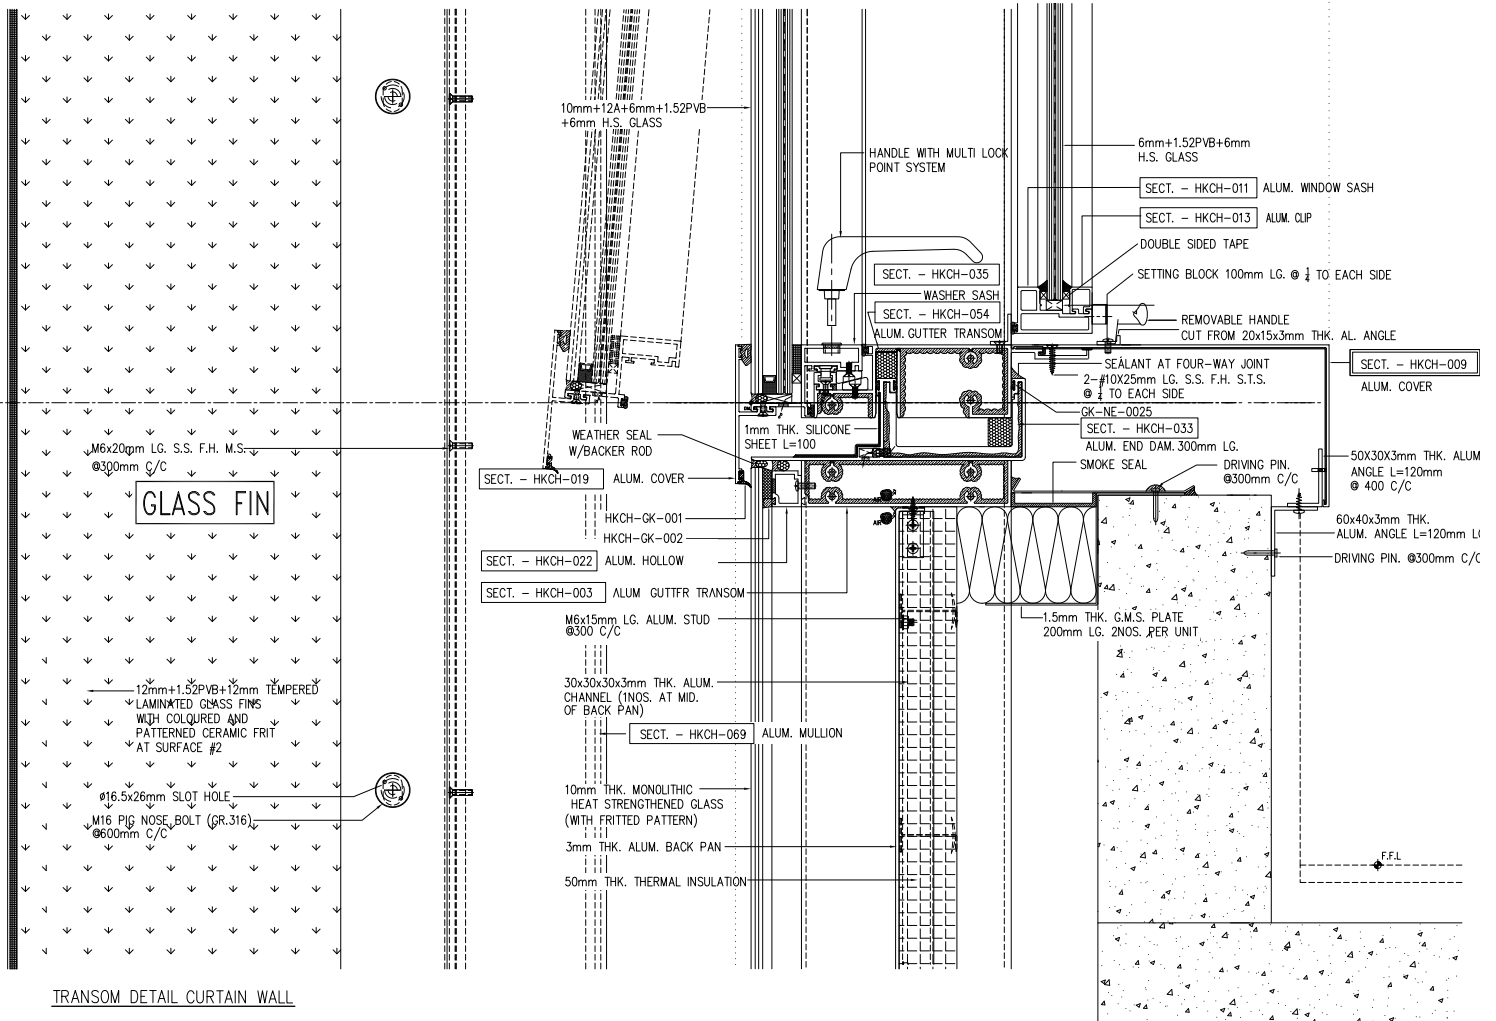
Section details of curtain wall. © Meinhardt Façade Technology (HK)
